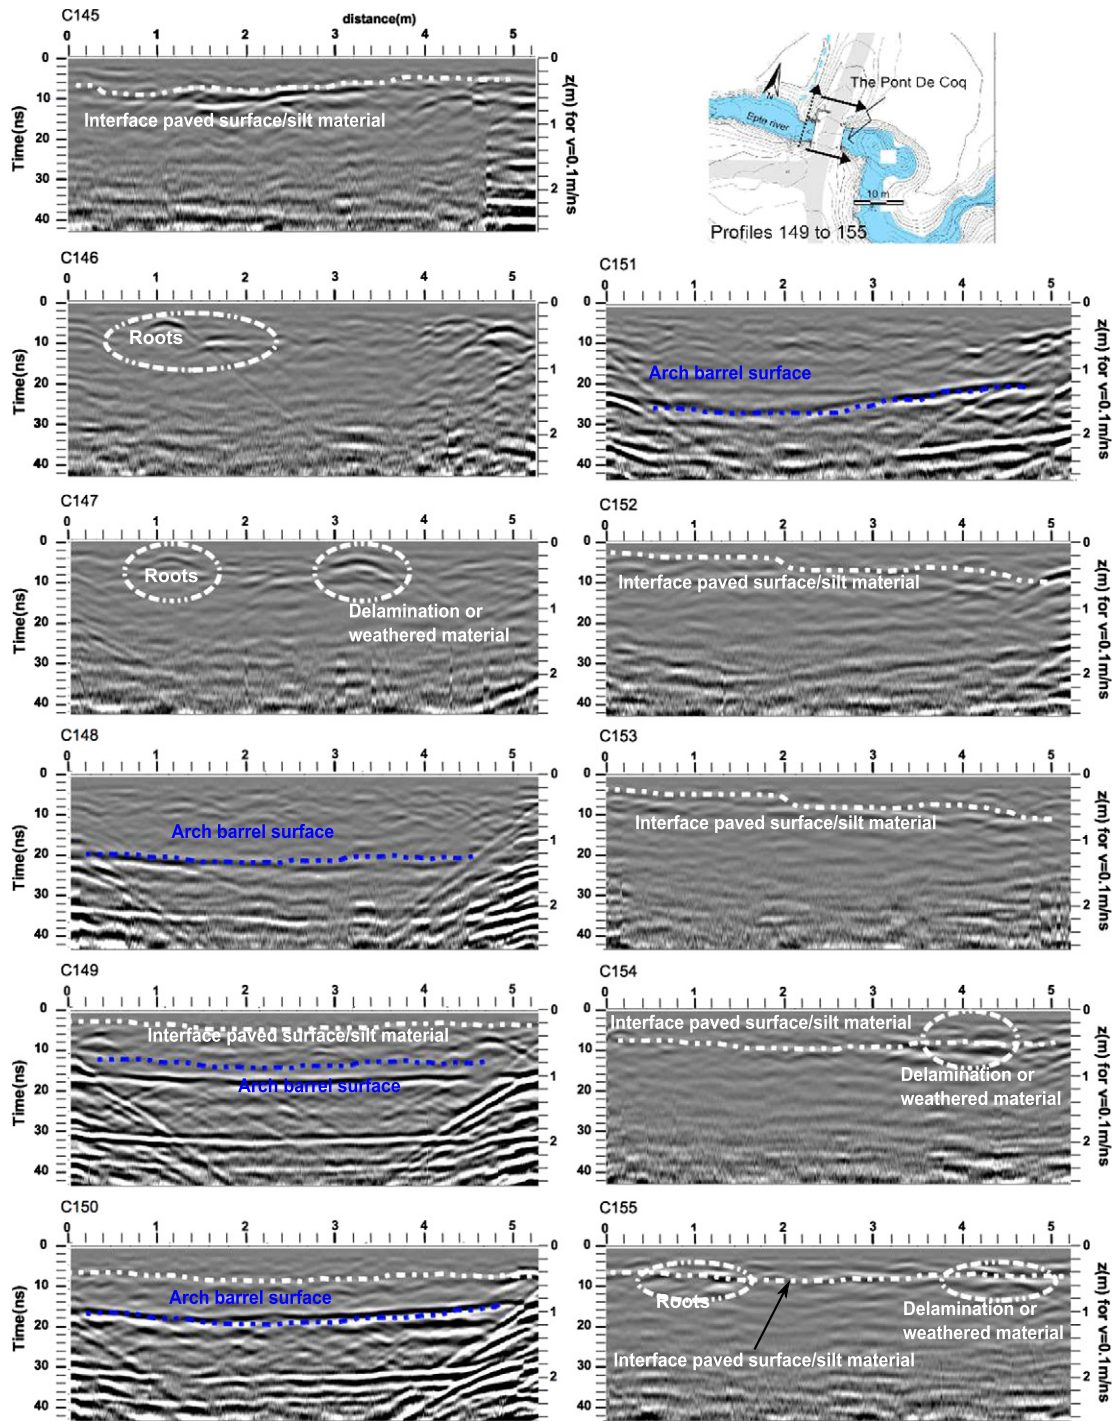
400 MHz GPR profiles performed on the bridge deck from west to east direction.
